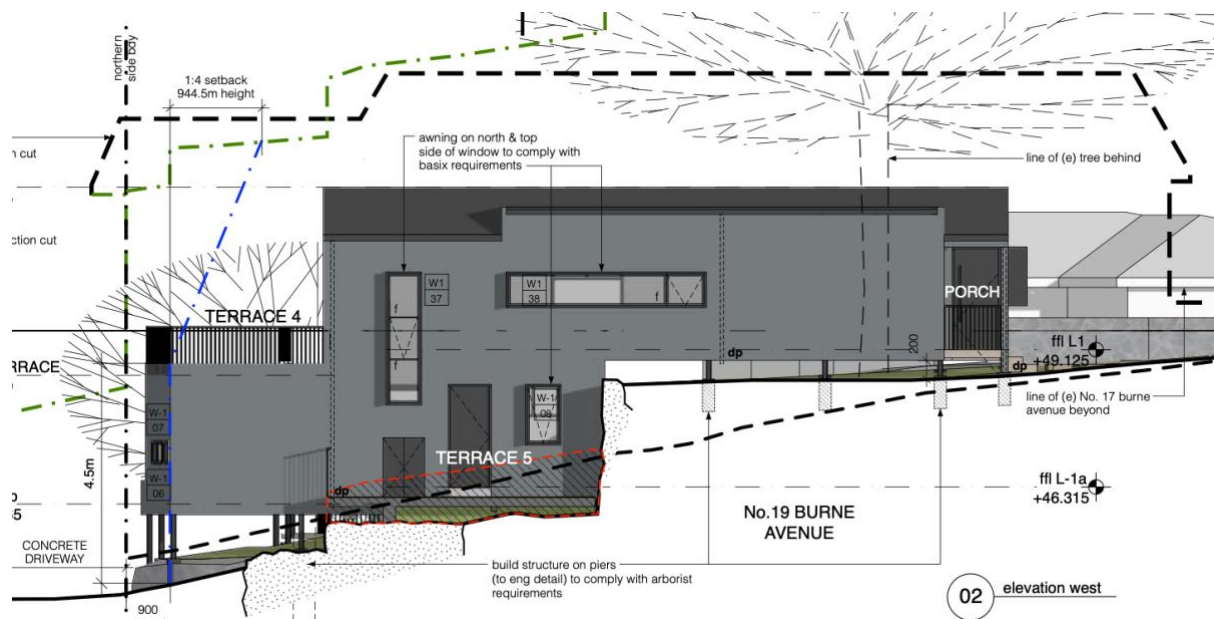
Extract from plan DA-14, prepared by Romina Rojo Studio, showing the western façade of the proposed secondary dwelling
